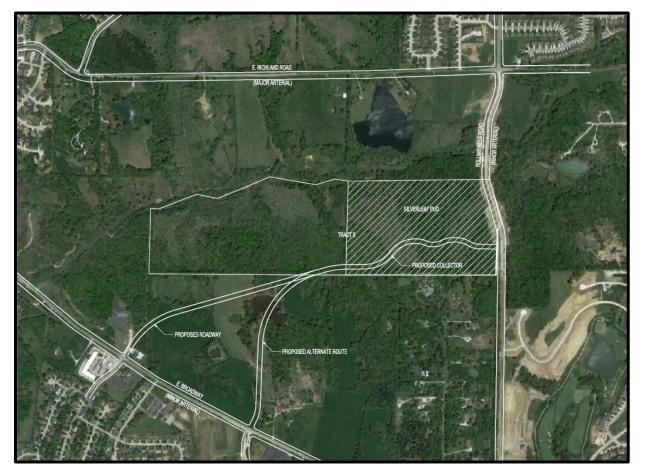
Potential New Collector Road Alignment - Rolling Hills Road to Highway WW
